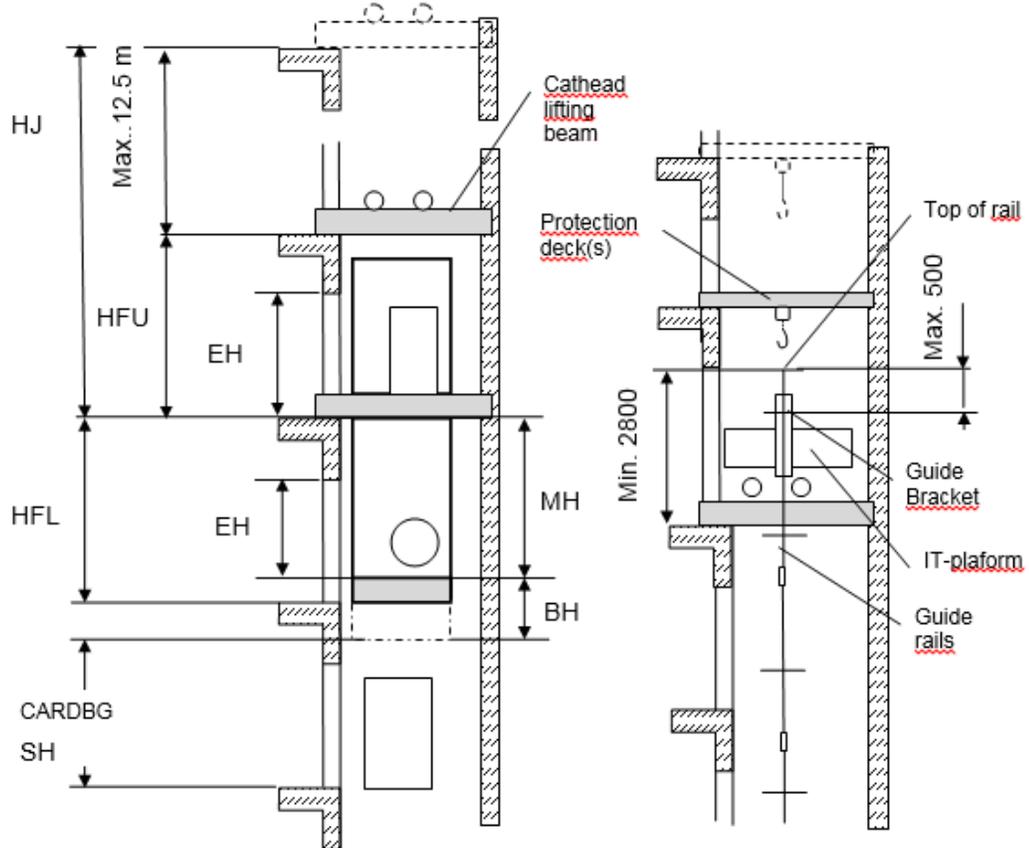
Wireframe of jumplift system restricts (Engineering instruction, 2017, p. 47).
